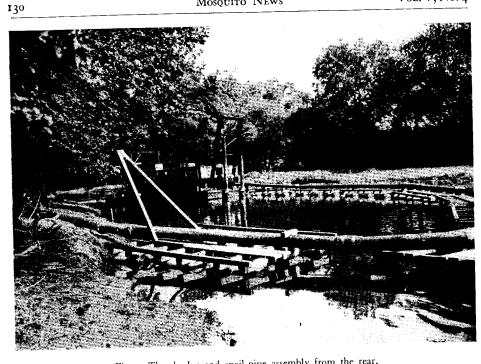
The dredge and spoil-pipe assembly from the rear.
